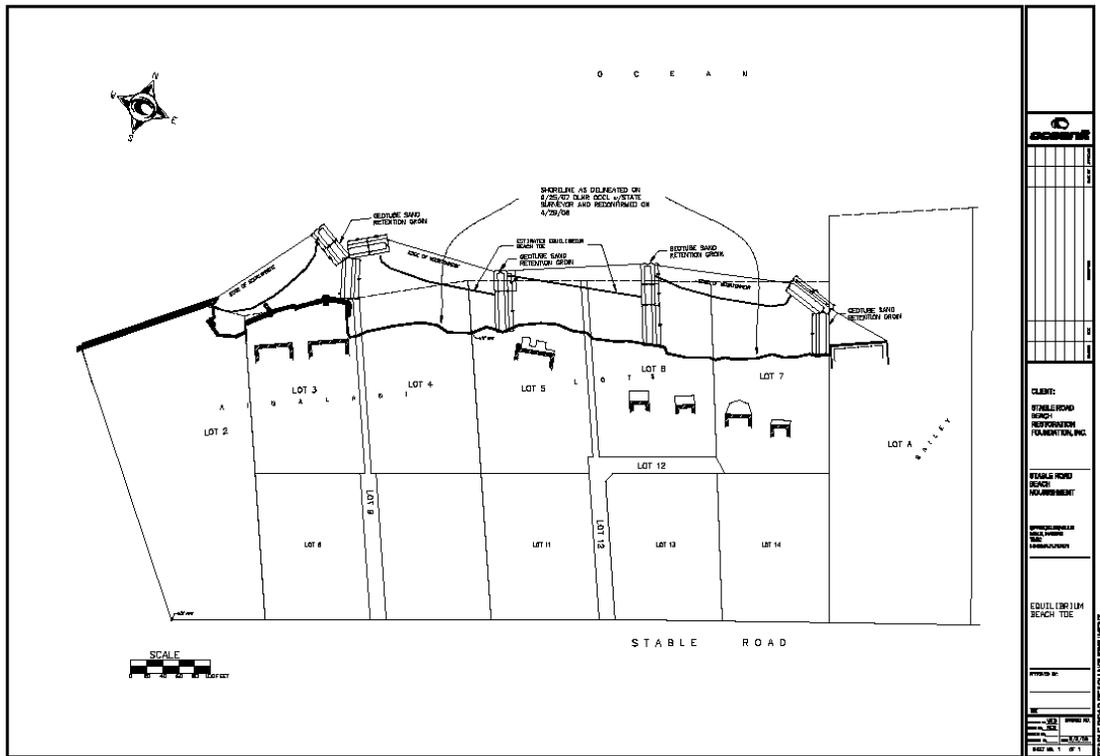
Beach Equilibrium Site Plan Prepared By Coastal Engineer
